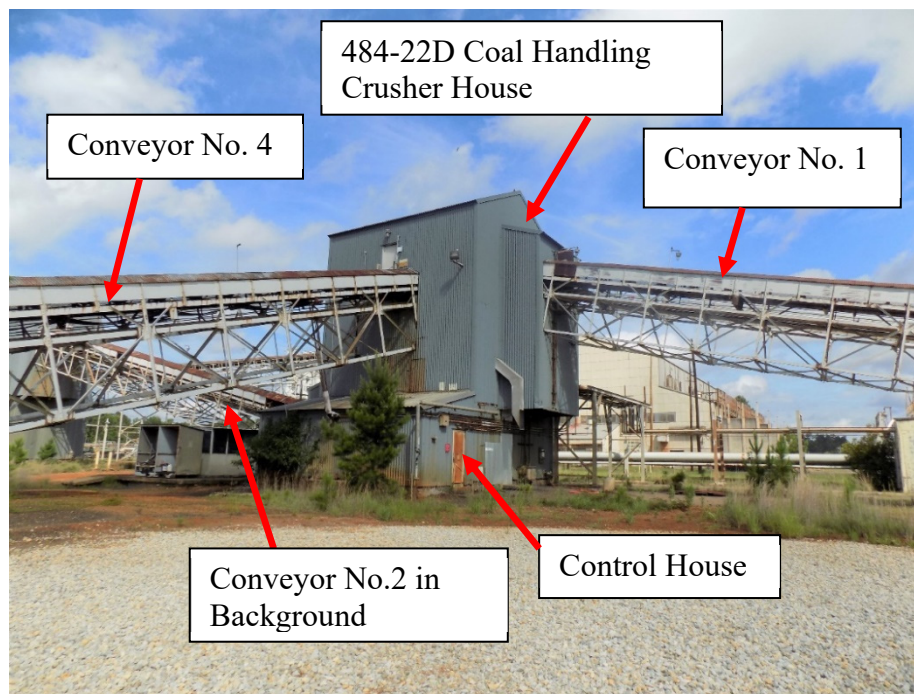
484-22D Coal Handling Crusher House Looking North from 484-17D Coal Yard
